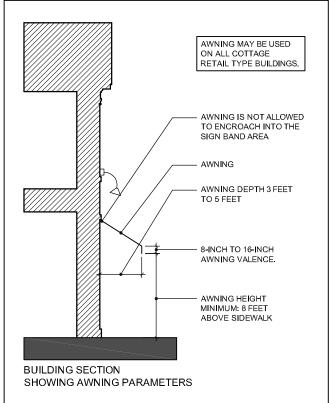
COTTAGE RETAIL TYPE AWNING
